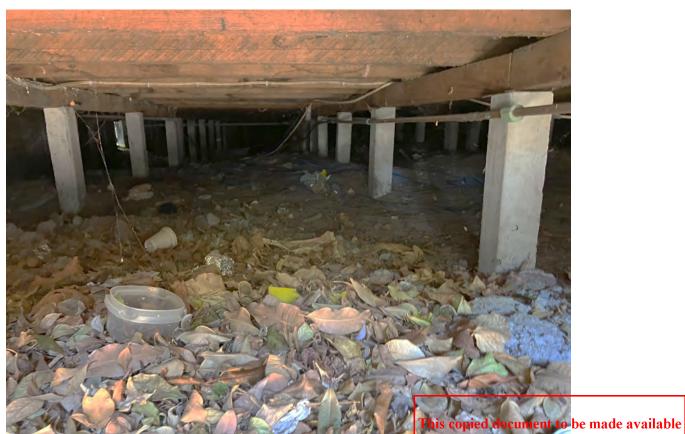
Underfloor cavity of 11 Beach Street Frankston.
